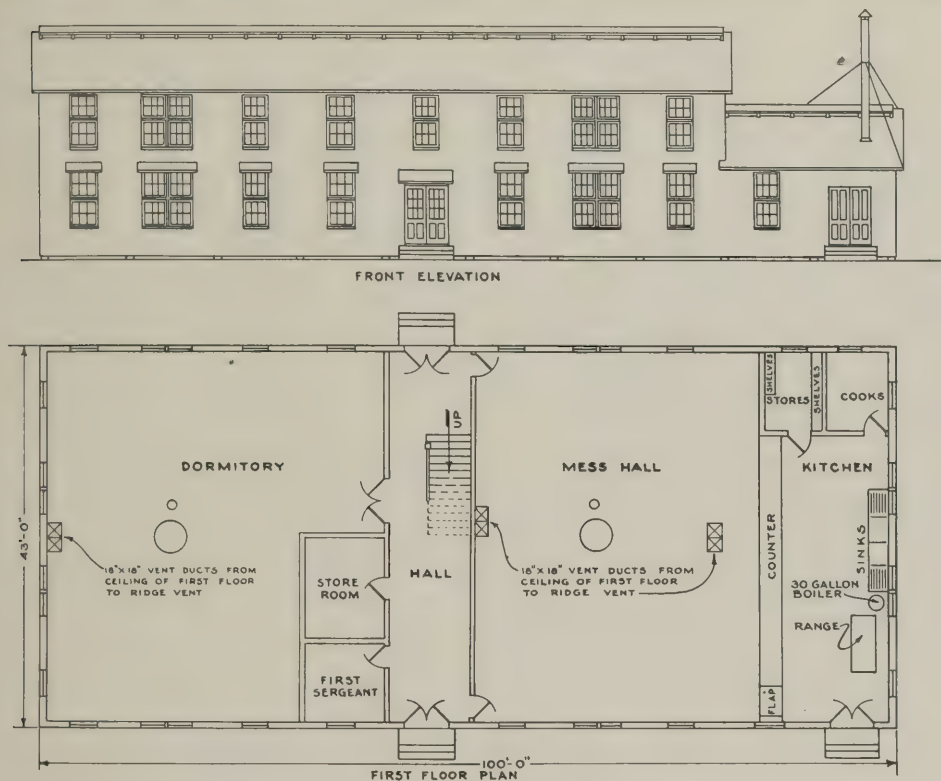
Two-story barrack for 123 men, providing about 37 square feet of floor space and about 375 cubic feet of air space per man
